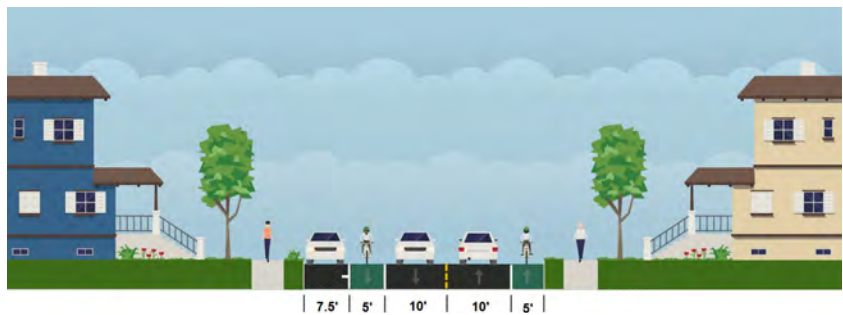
(b) - Proposed Cross-section: Thomas Street Bike Lane Concept (On-street parking removed on one side)
